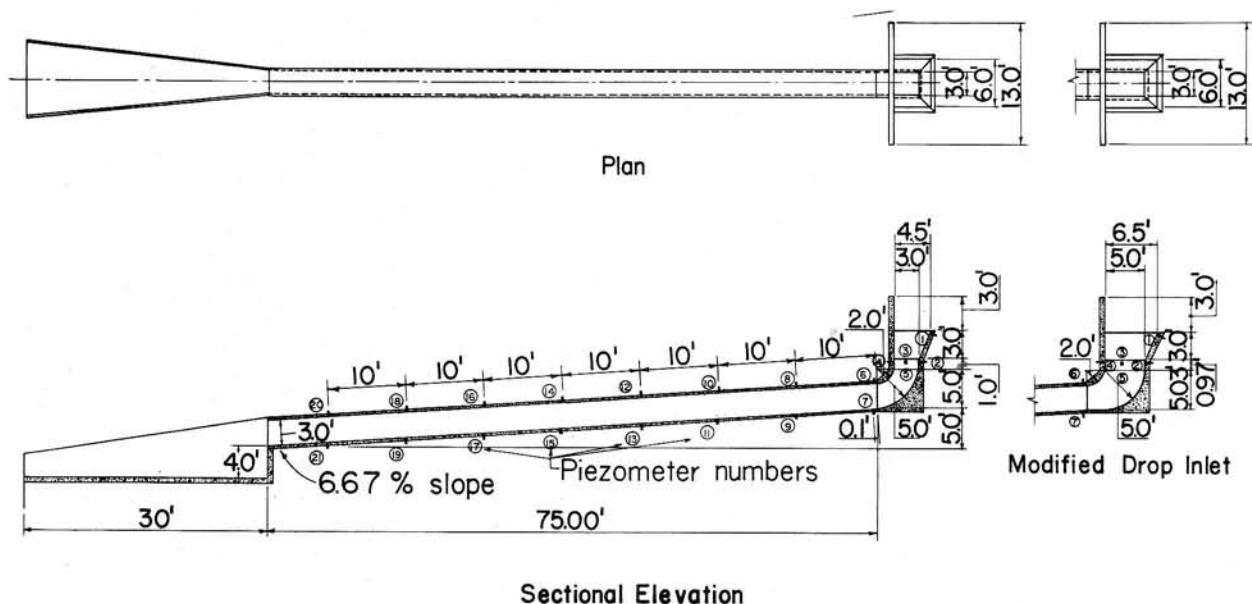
3-ft Square Drop Inlet Closed Conduit Spillway, Crawford County, Iowa.
